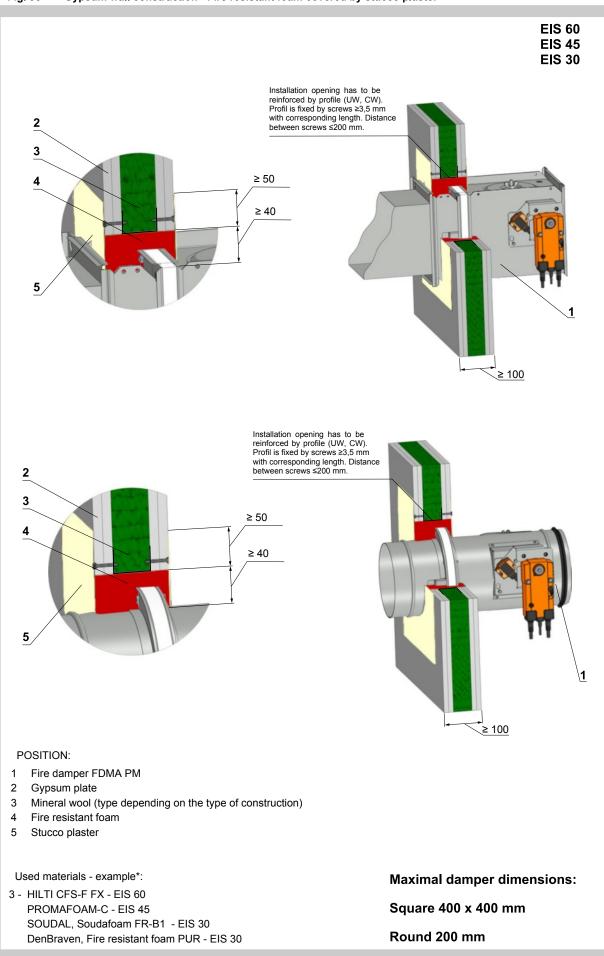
Gypsum wall construction - Fire resistant foam covered by stucco plaster
